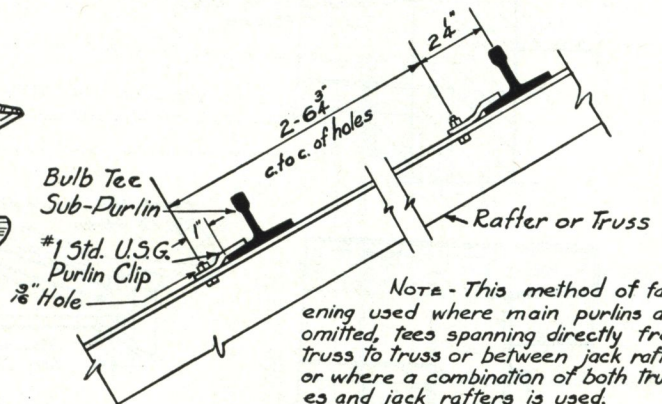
DETAILS OF SHORT SPAN PYROBAR ROOF TILE
